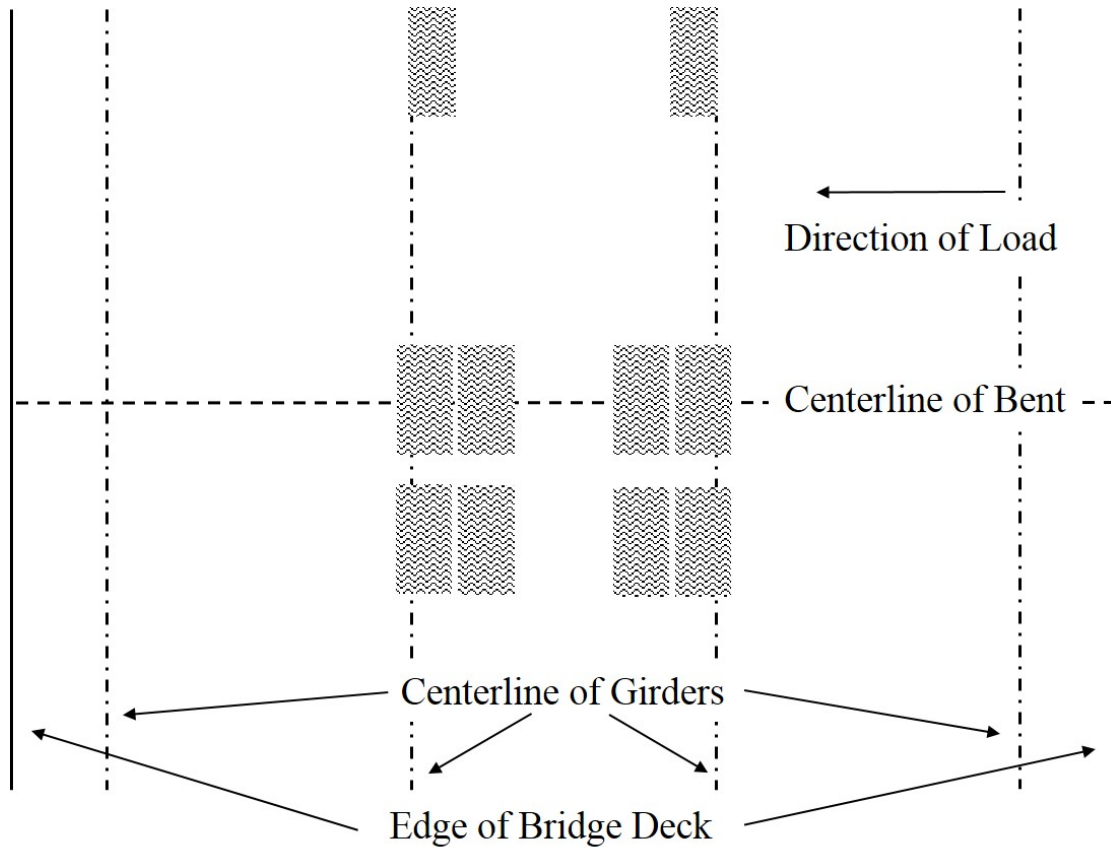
Placement of Load Truck during the Third Macon County Road 9 Load Test
